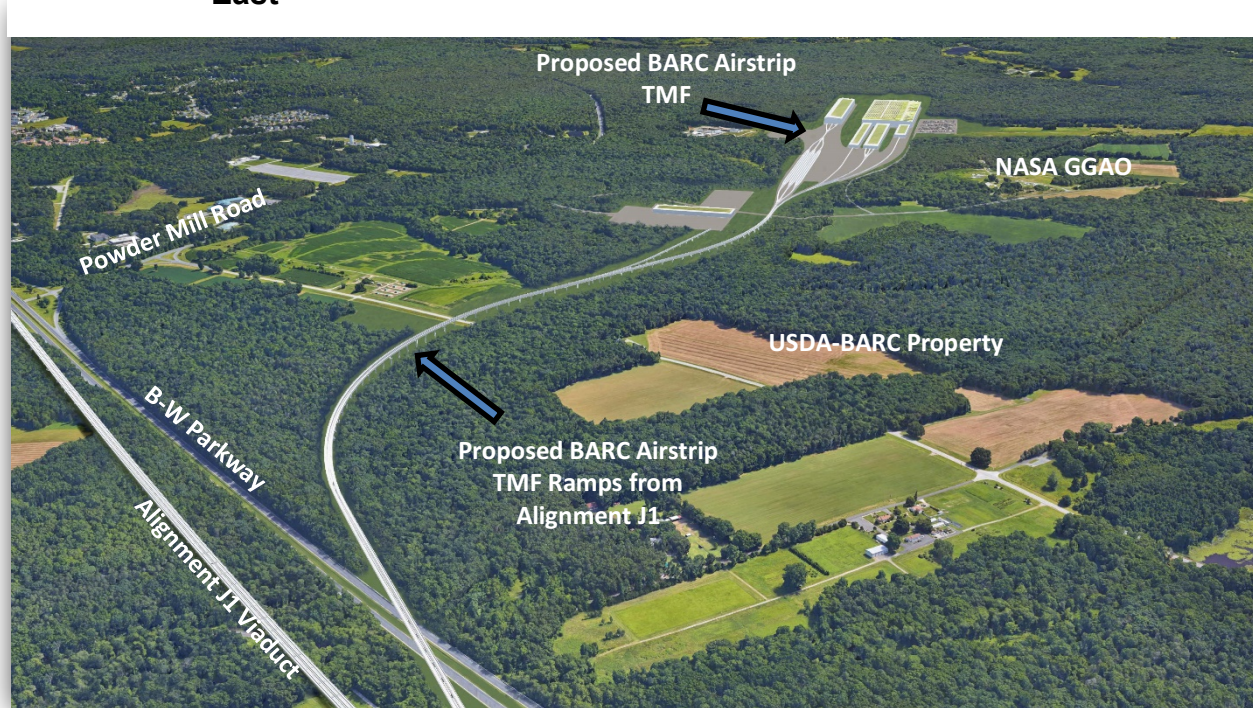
CAAs #5 and #6 AFTER: Illustrative Rendering of Proposed BARC Airstrip TMF and Corresponding Ramps with Alignment J1, Looking East
